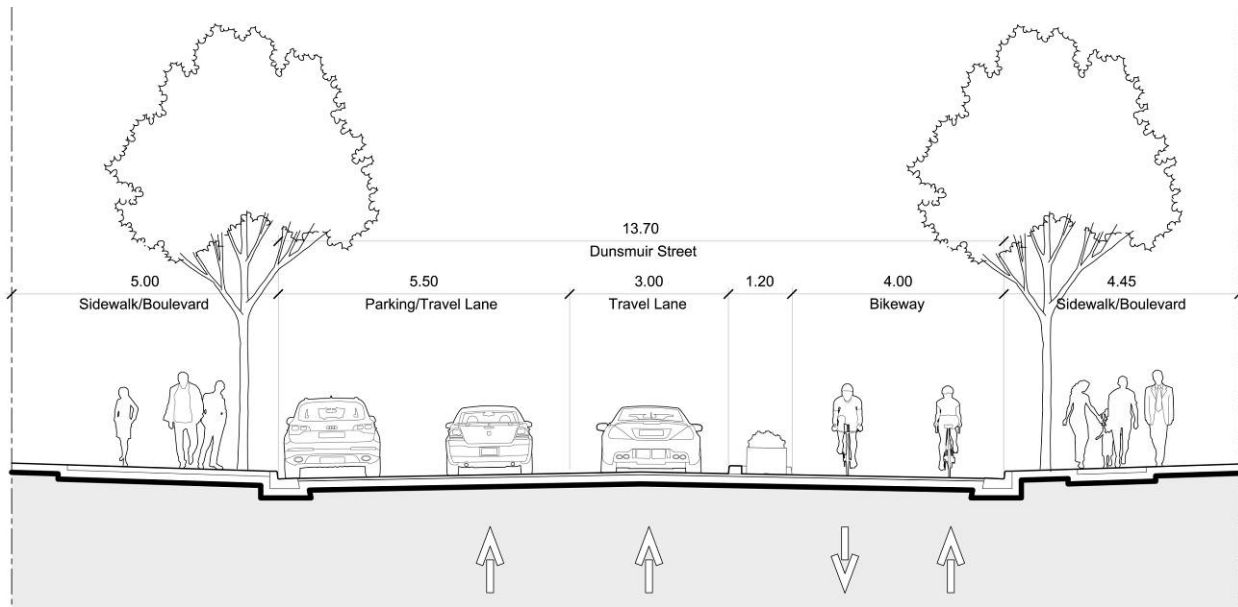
Proposed cross-section of Dunsmuir Street between Beatty and Richards Streets (looking west)
